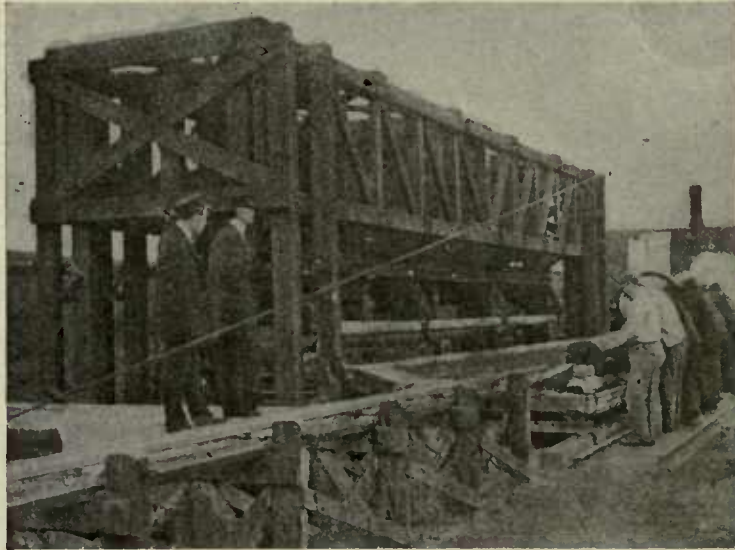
MANUFACTURE OF ROLLED CONCRETE PILES.
